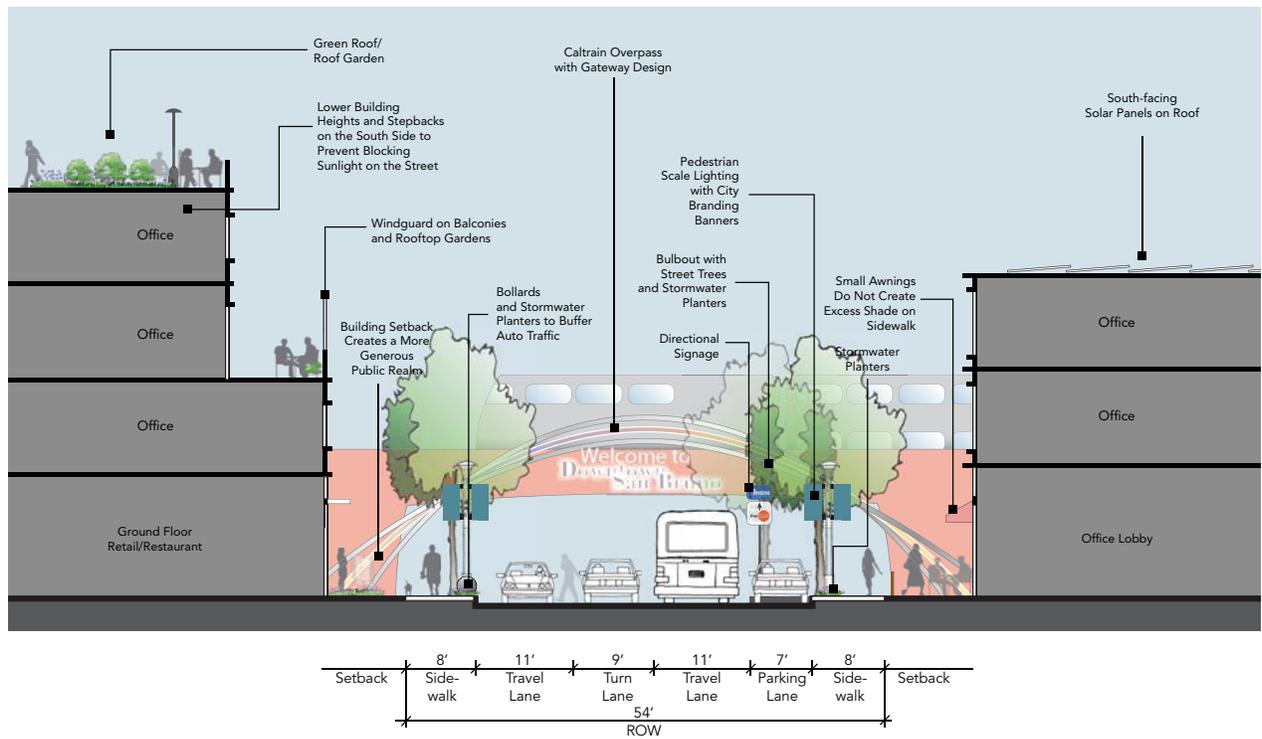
Proposed Improvements (San Bruno Avenue facing west between San Mateo Avenue and US 101)
